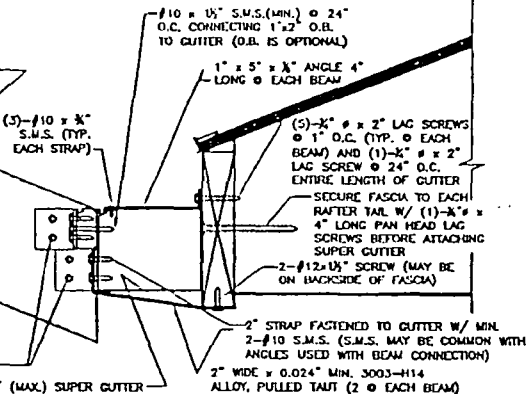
TYP. PLUMB FASCIA CONNECTION
